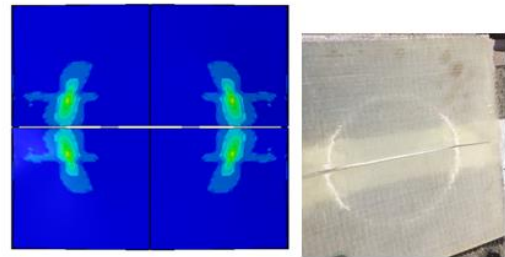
Failure modes after performing bending test on the plates with connection type 2 (Numerical and experimental)
